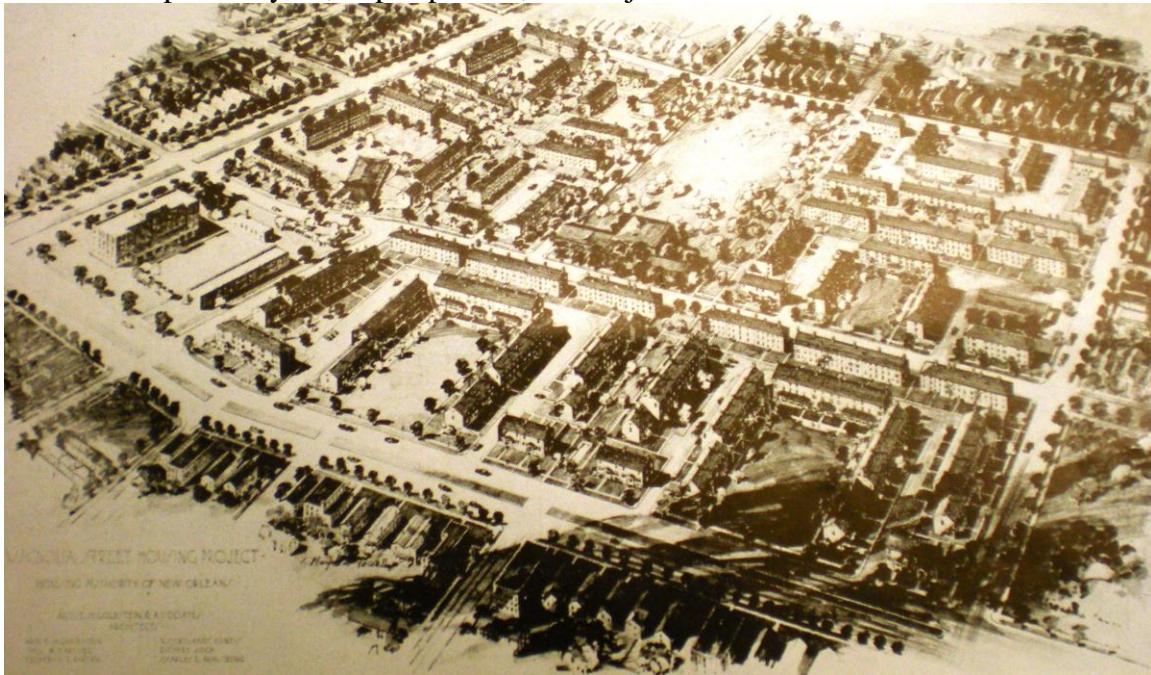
Proposed layout, in perspective, for Project LA-1-7.⁵⁰
